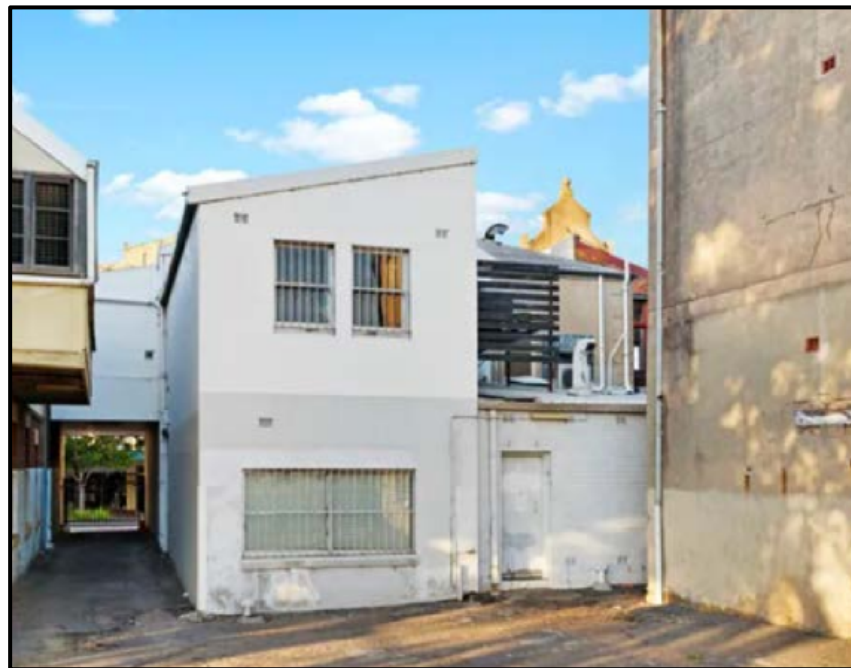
Eastern boundary of the site, showing ROW access to High Street Figure 4: Eastern elevation of existing building (Source: SOHI, caste Studio, 2022)
